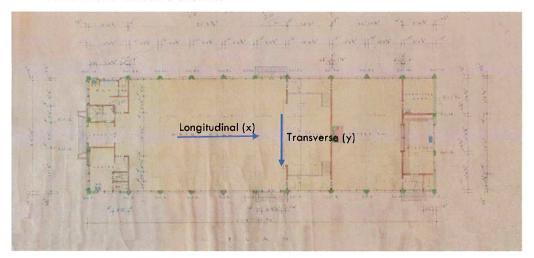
Original floor plan with longitudinal and transverse directions noted.
